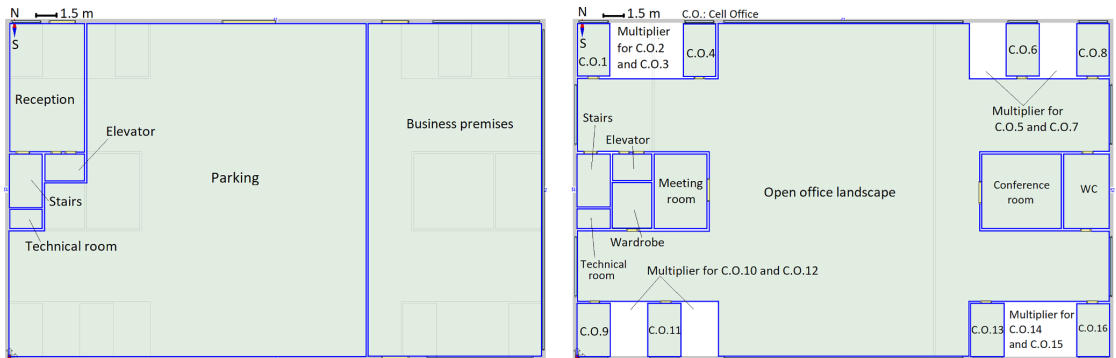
Generic ground floor plan, the first floor plan (left), and the second and the third floor plans at level 3.4 m and 6.8 m (right) with thermal zones.
